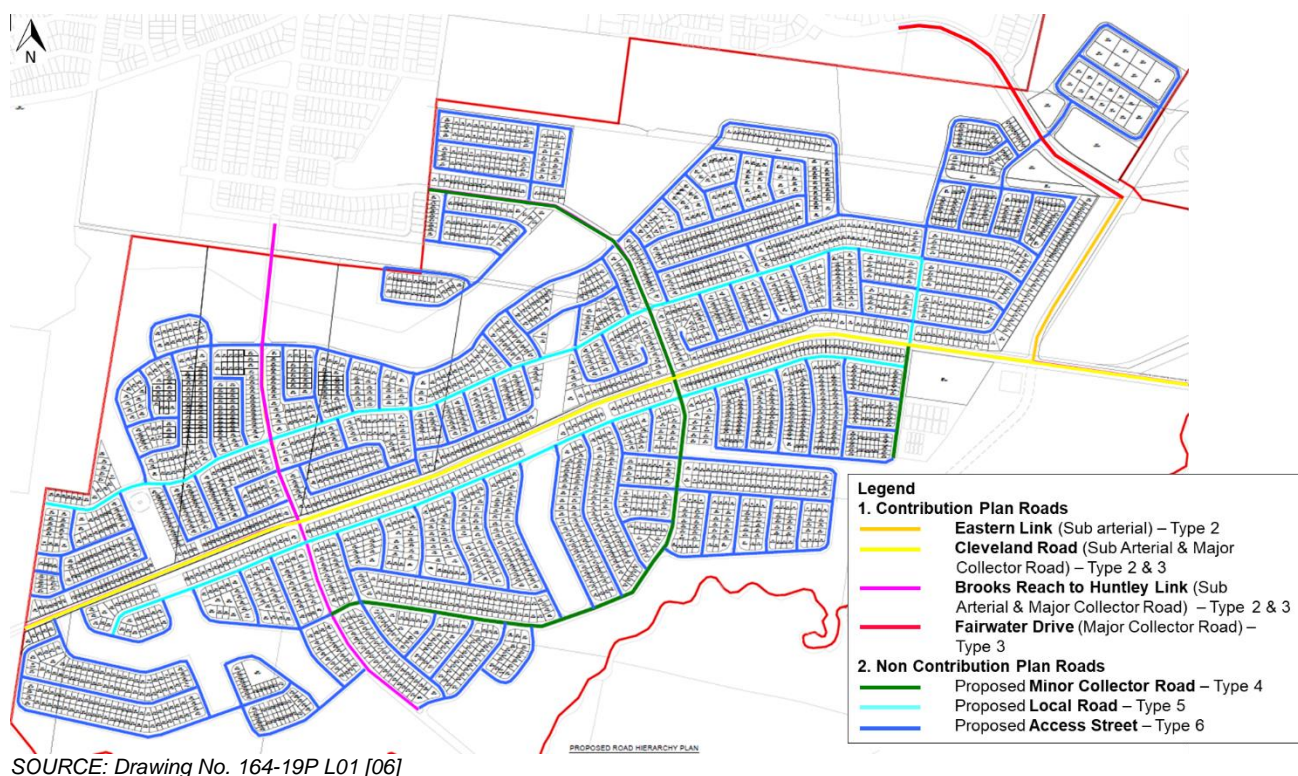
Proposed Development Roads in the Contributions Plan 2020
